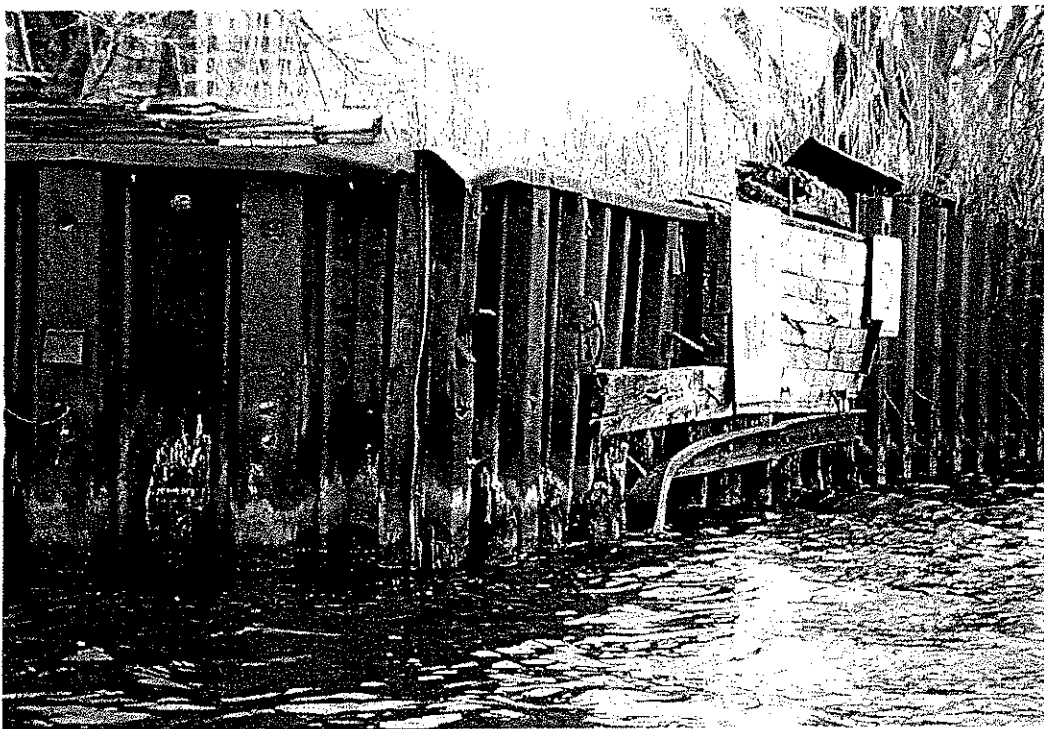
View of Dockwall at Station 2+00, Looking North.
